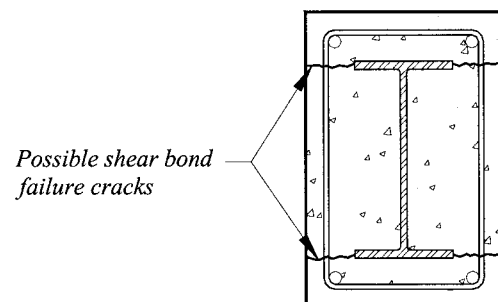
Shear Bond Failure Cracks along Interfaces of Steel Flanges and Concrete
